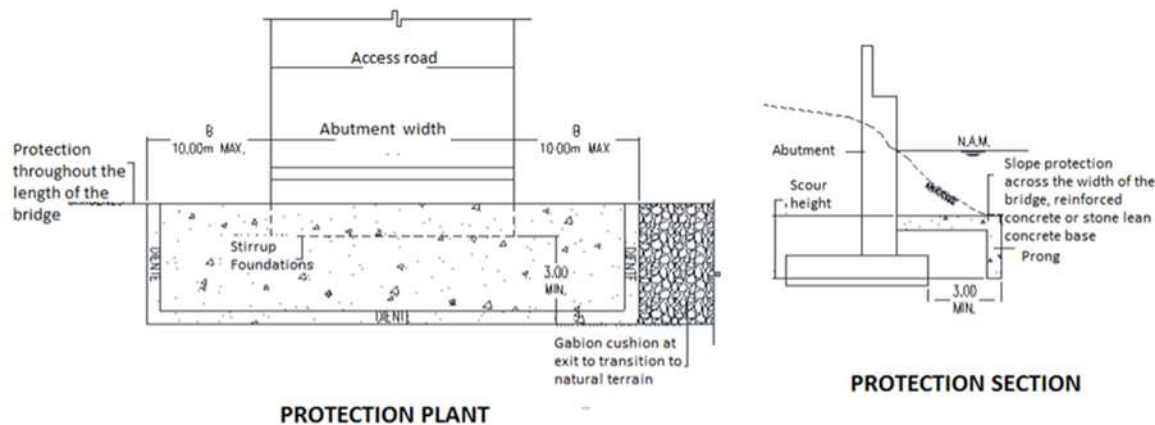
Local protections for abutments. (SPOP, 2014)
